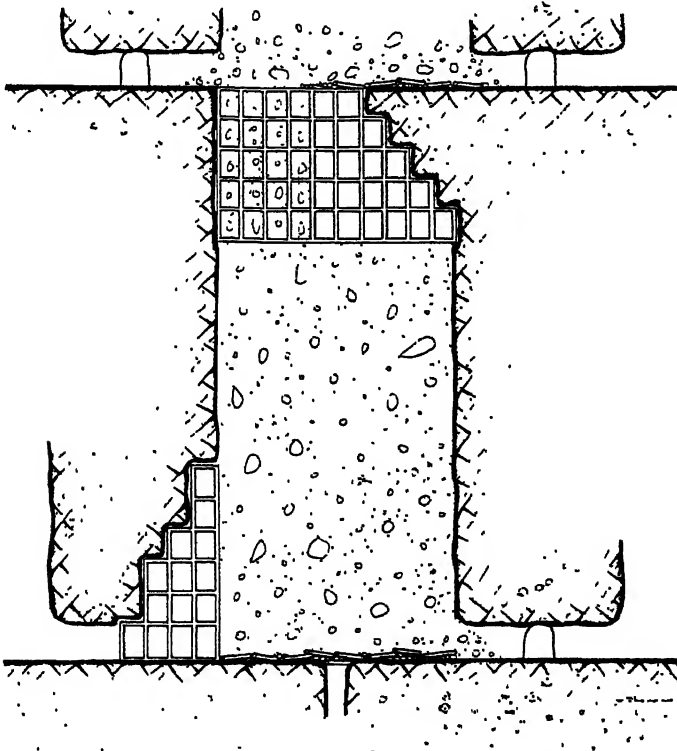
METHOD OF RECOVERING CROWNS AND PILLARS AFTER STOPES ARE WASTE FILLED.
